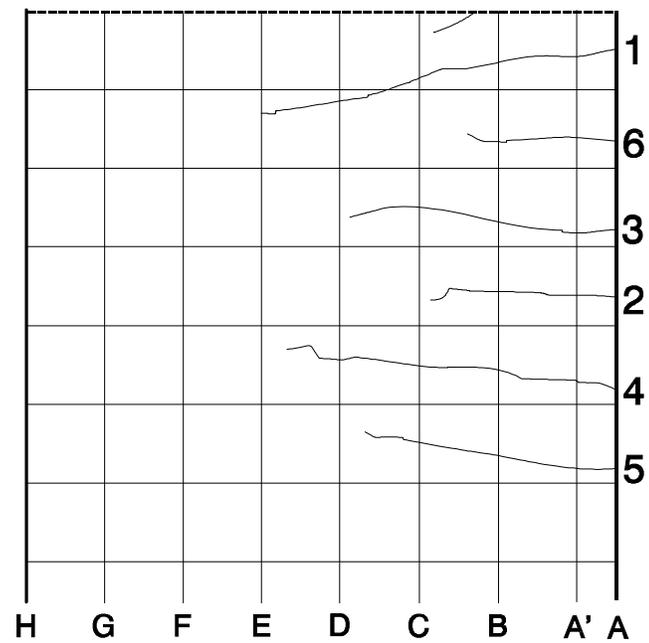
POJ-RC-100 cracking pattern on south face of pier service load
